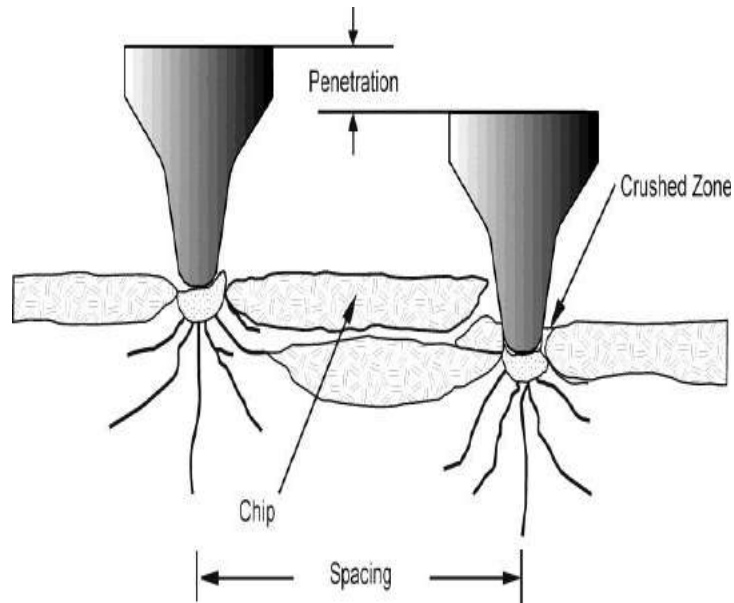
Chipping process of a disc cutter (Frenzel, 2011).
